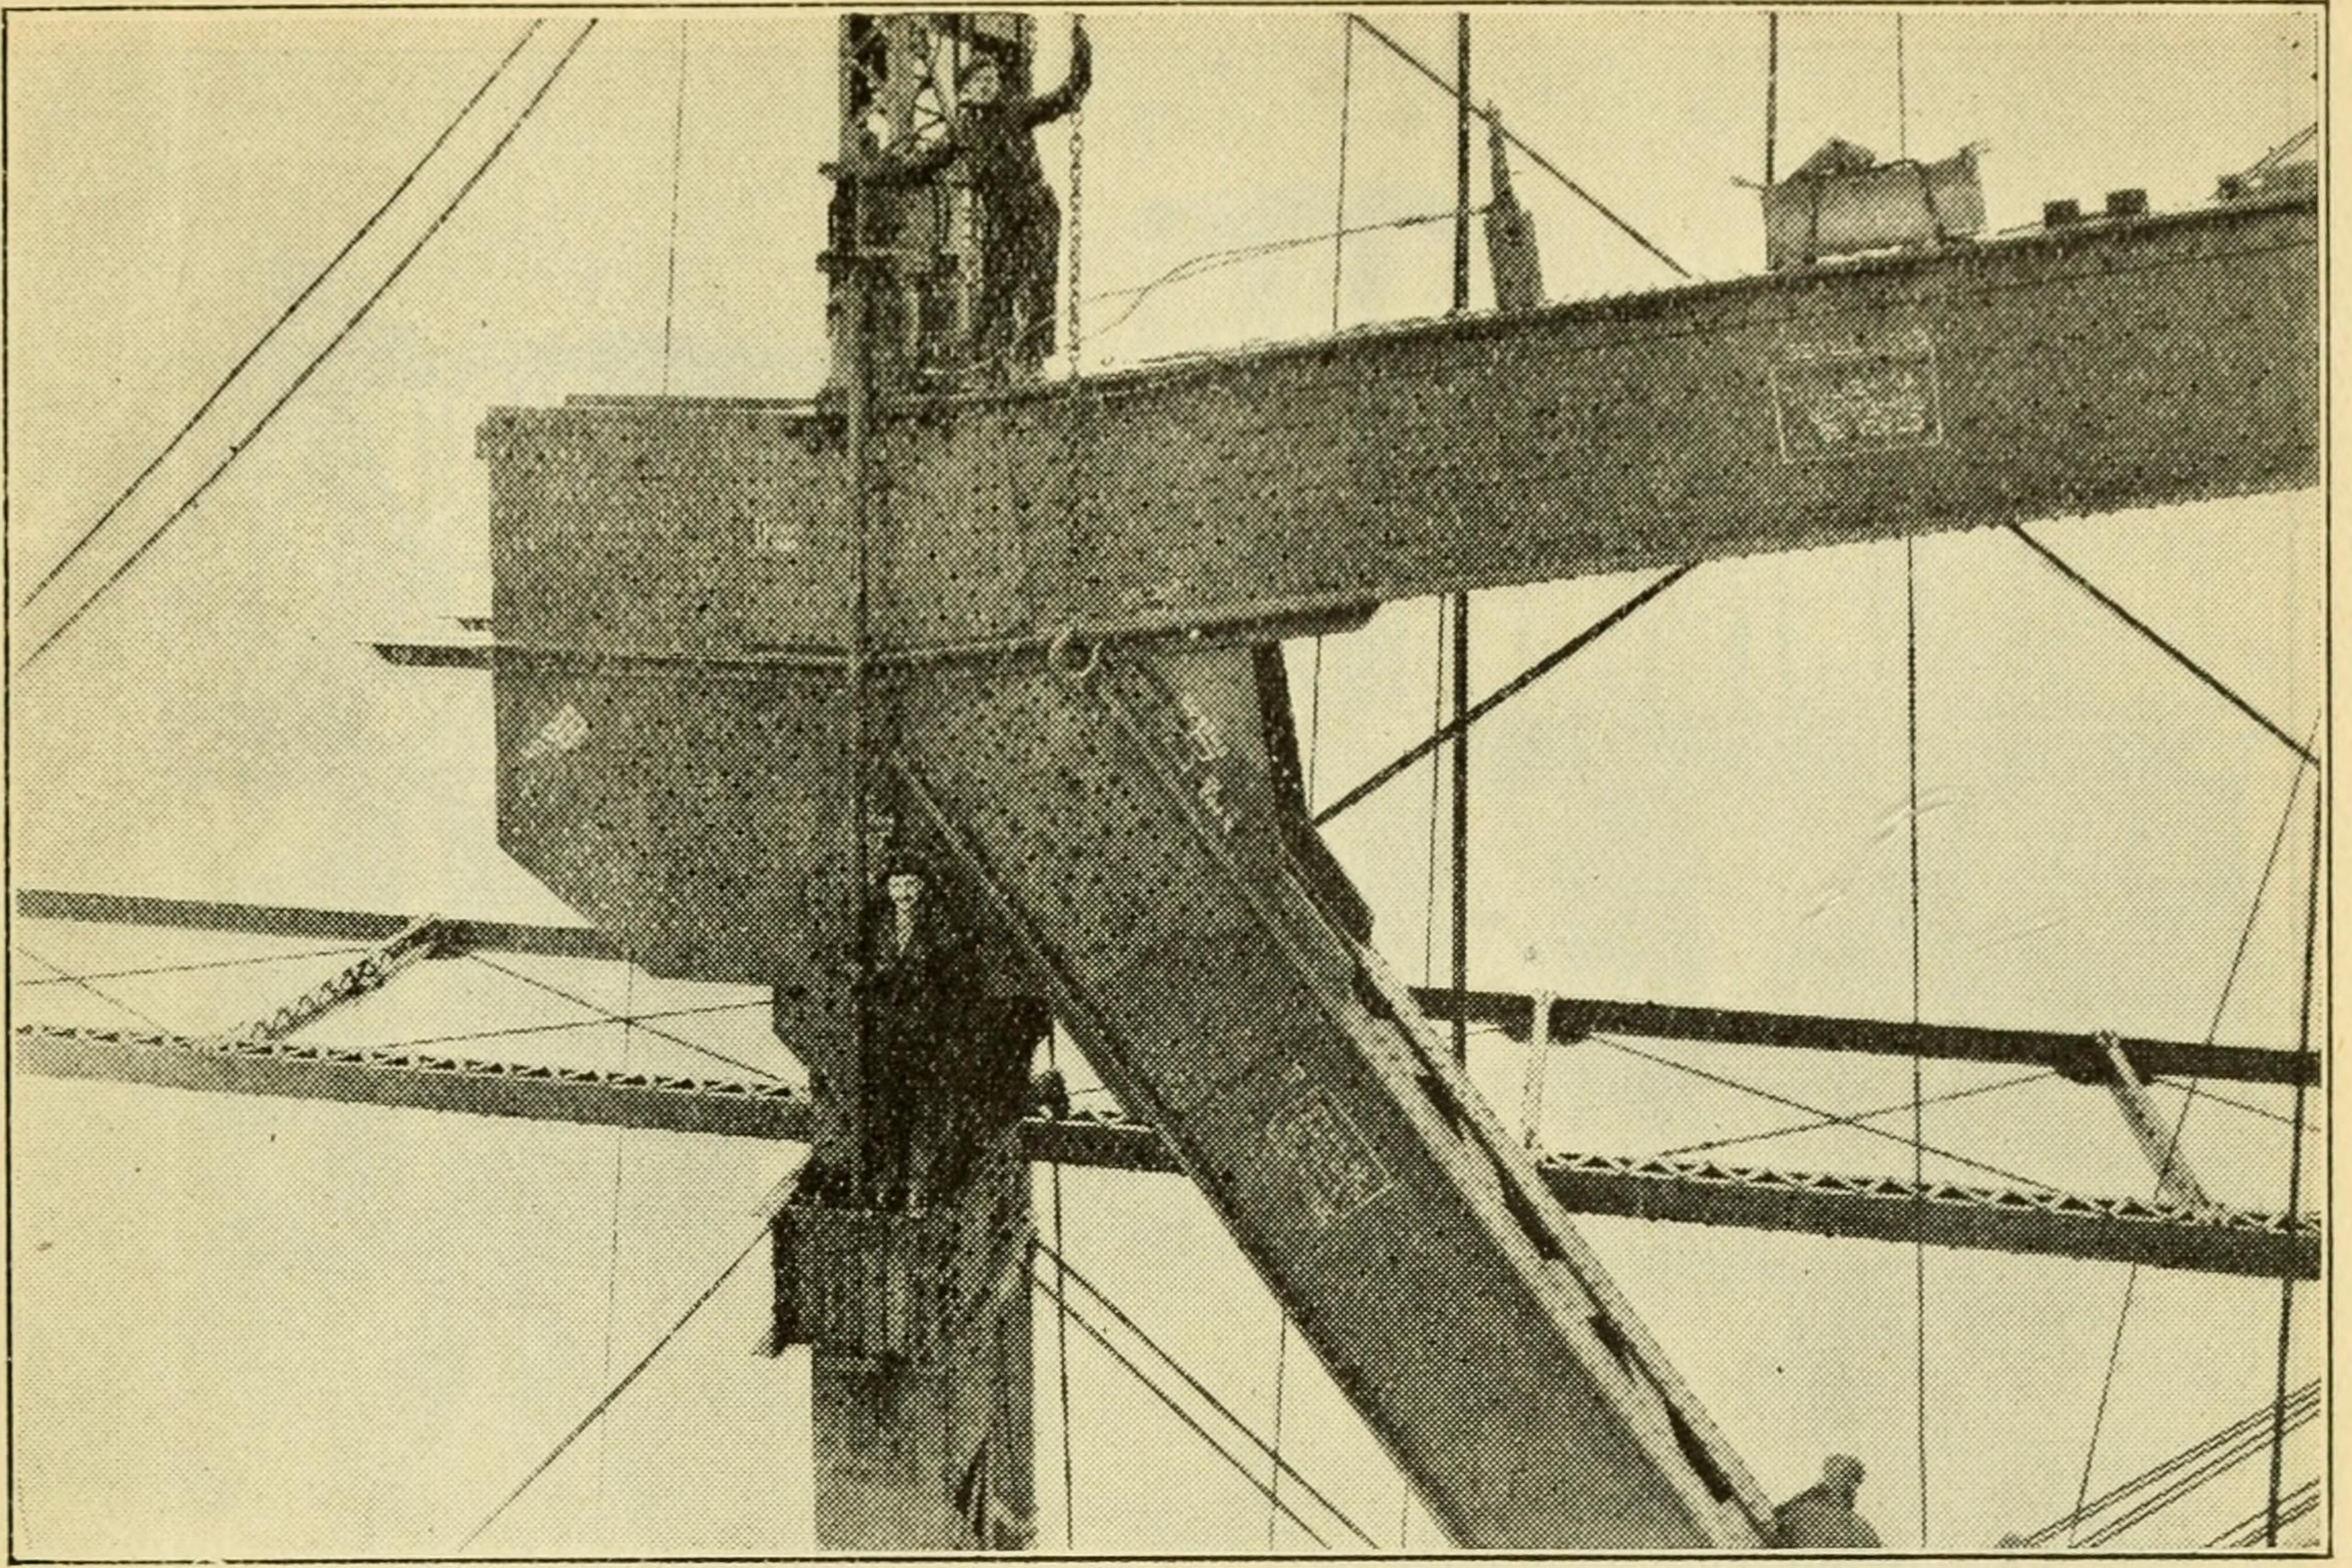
SPECIAL JACKING APPARATUS, SCIOTOVILLE BRIDGE.
